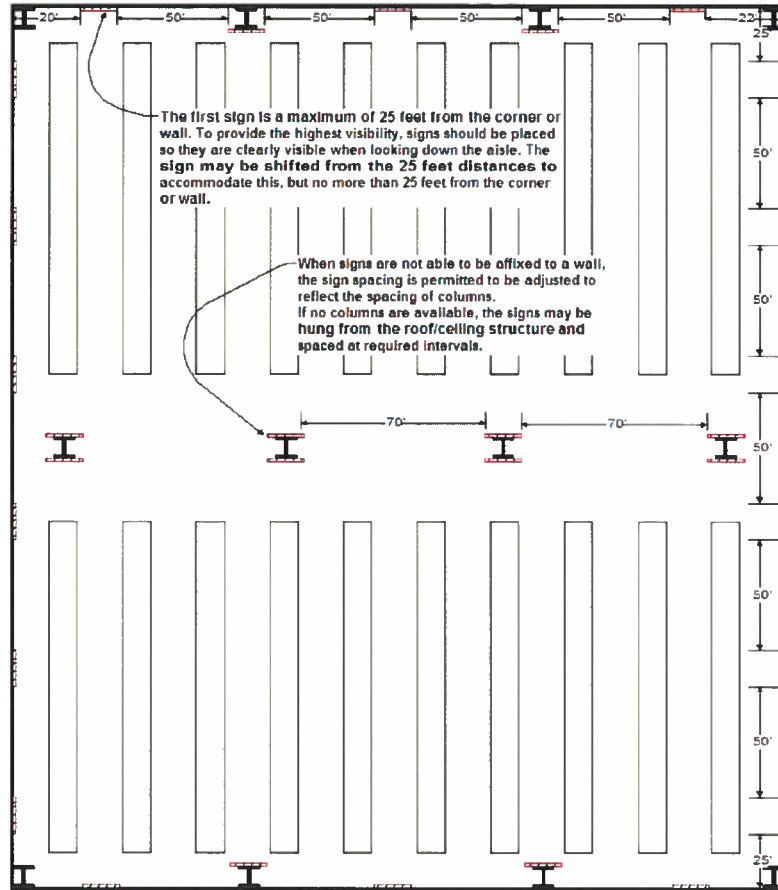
SIGNAGE PLACEMENT AND SPACING EXAMPLE
